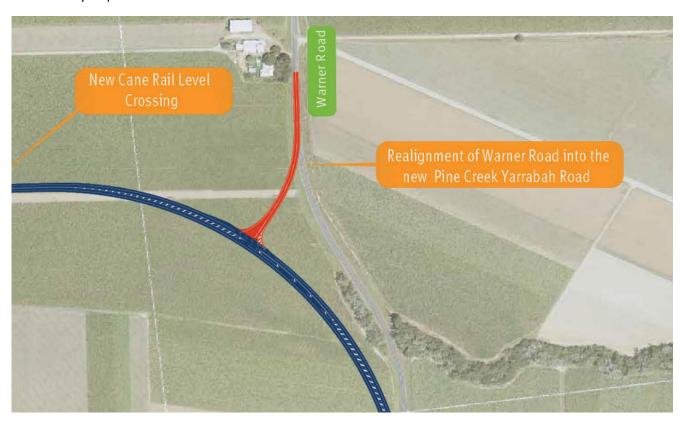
Warner Road to Pine Creek-Yarrabah Road intersection
